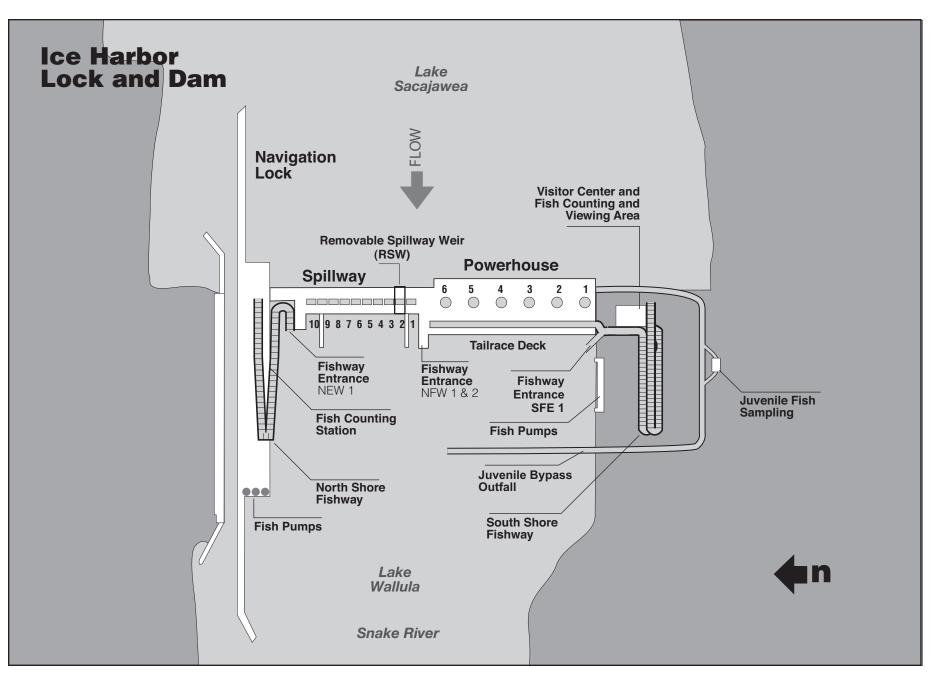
Ice Harbor Lock and Dam General Site Plan
